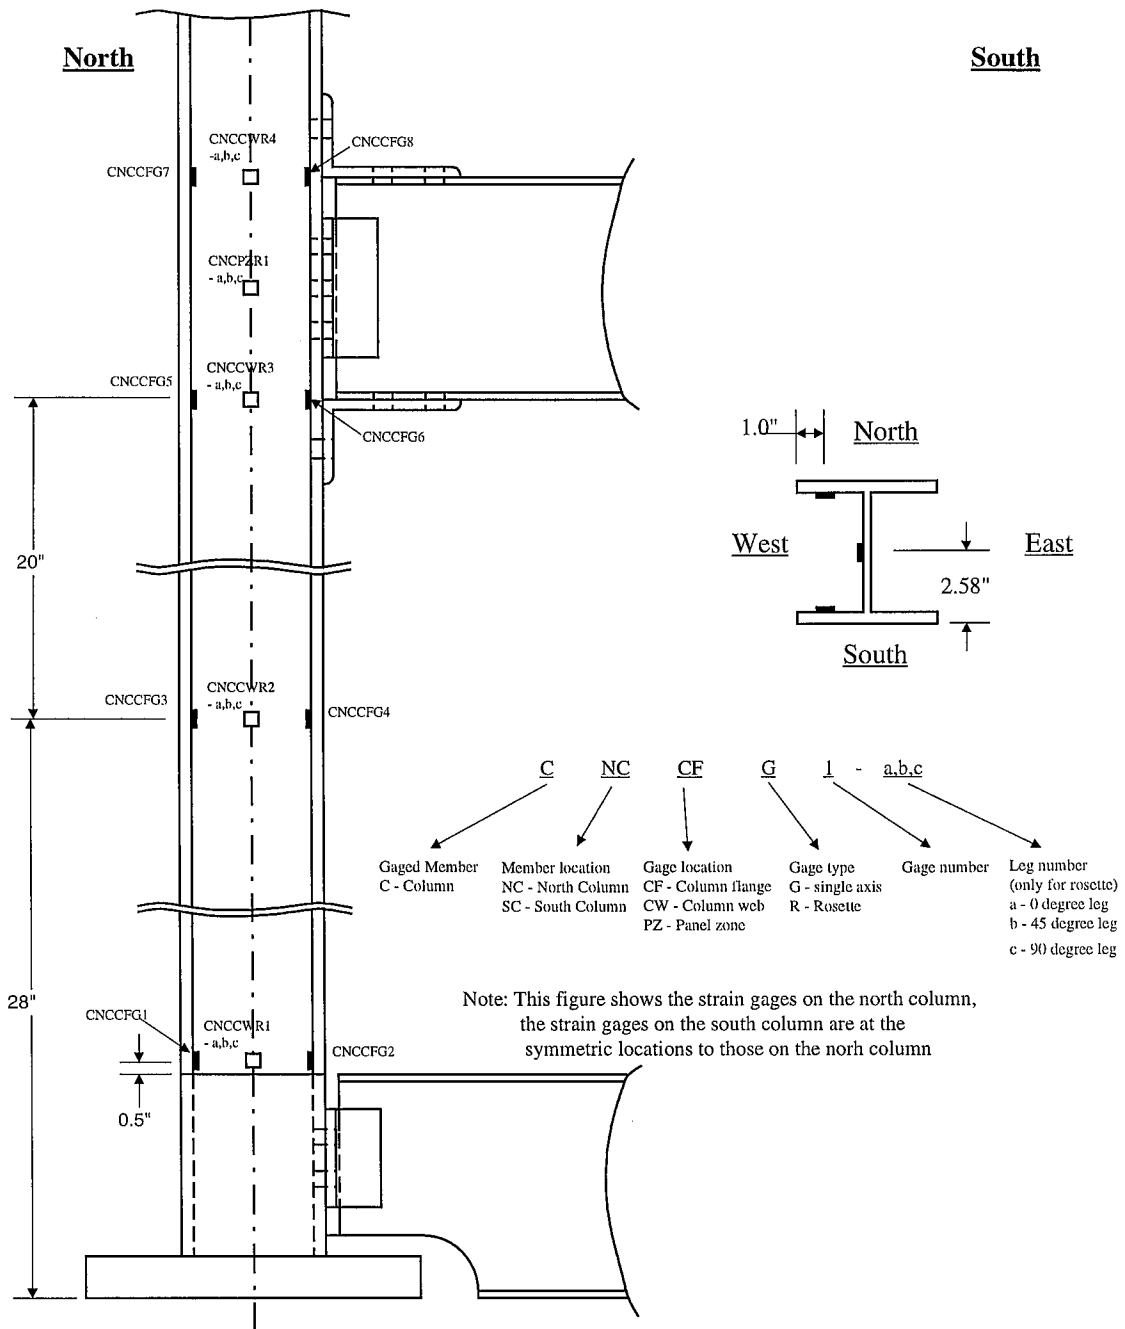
Instrumentation Plan: Strain Gages on the Columns
